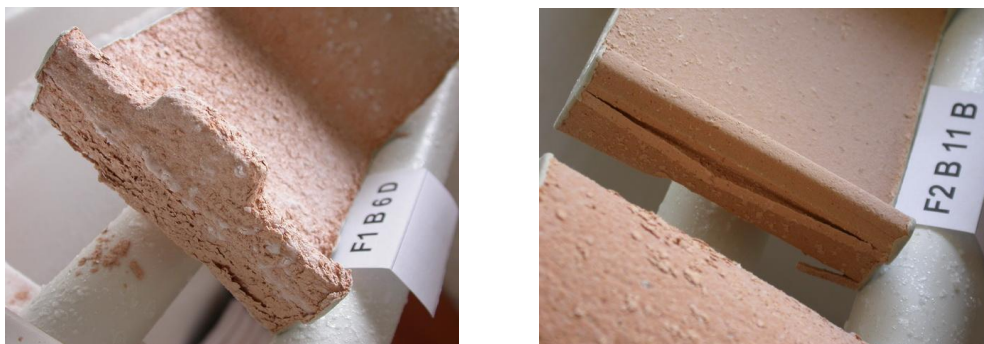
Delamination and Fissure/Fracture/Spalling caused by the composite test
